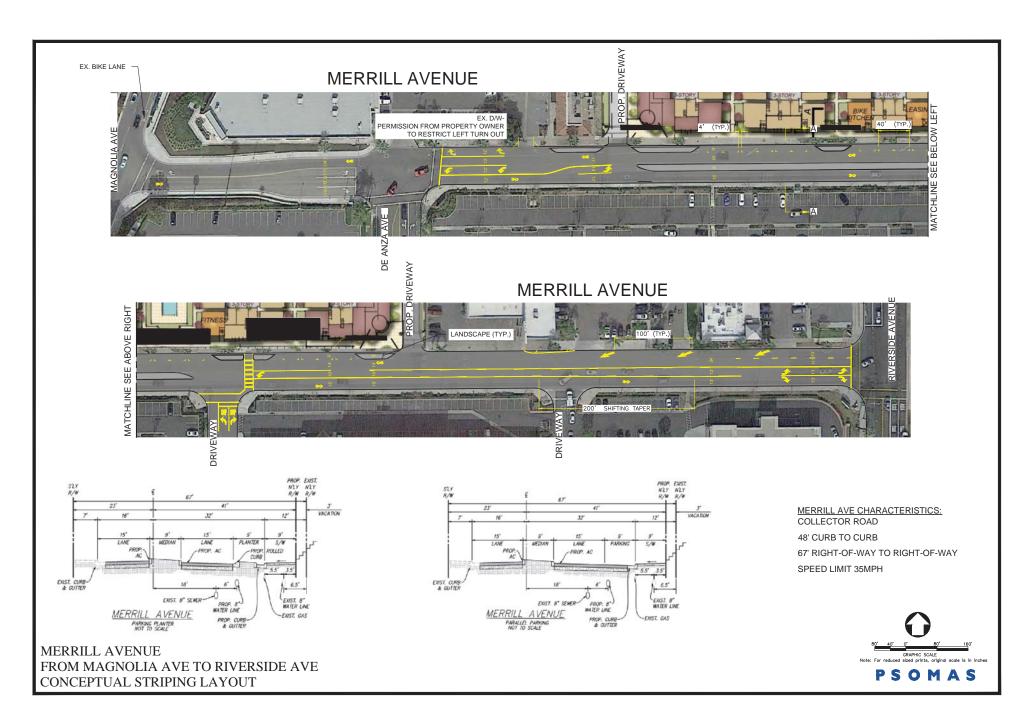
Project Plans (Merrill Avenue Street Section)
